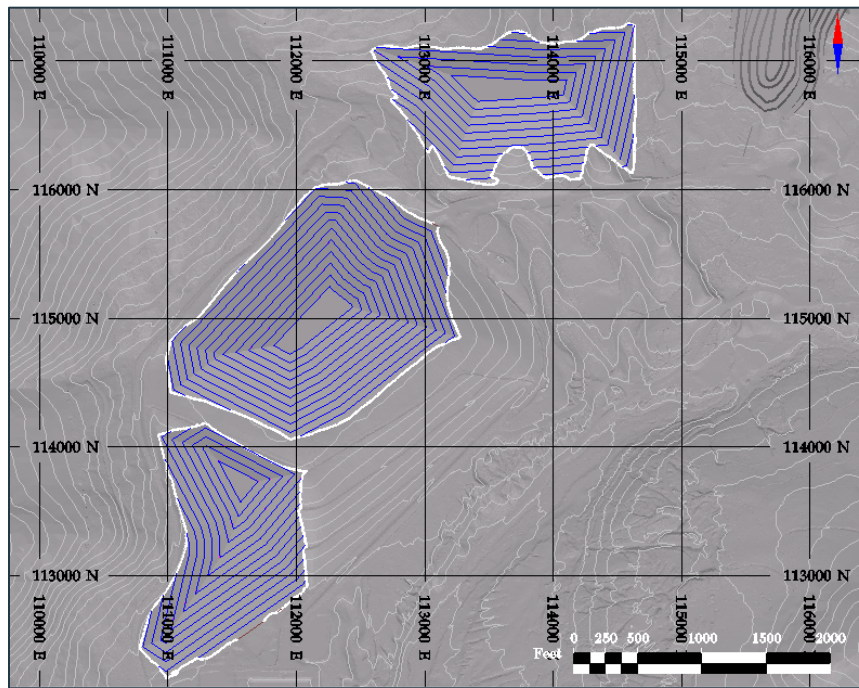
Waste Rock Facility – Arnett (Source: Wood, 2020)
